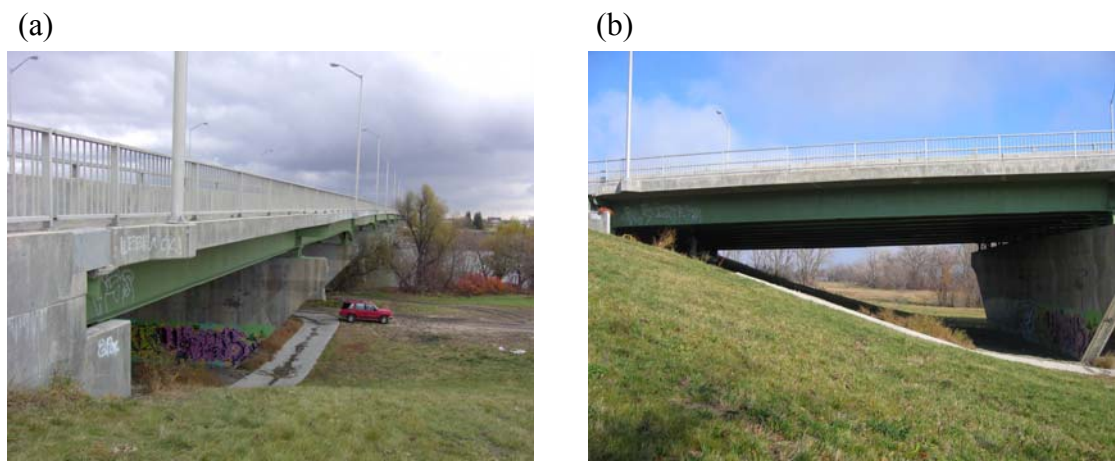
The North Perimeter Red River Bridge (a) the whole bridge view and (b) the west end span (steel-free concrete deck).
